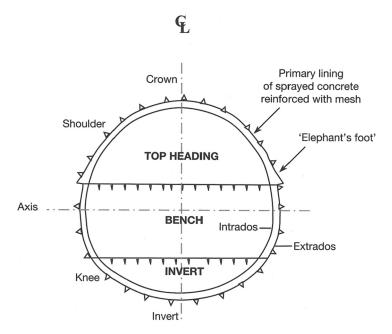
Cross-section of a SCL tunnel in soft ground
